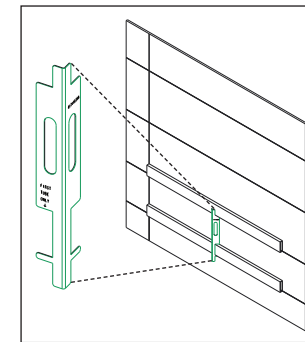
Use Horizontal Tube Layout Jig for Bottom Row
